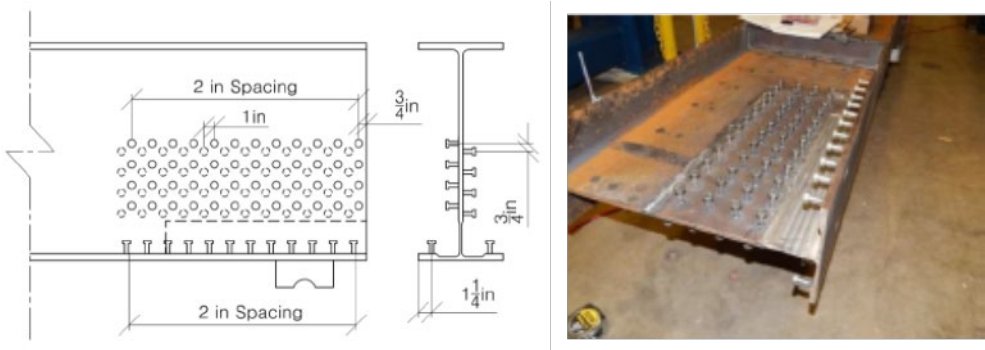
Shear stud layout on the repaired girder (Zmetra 2015)
